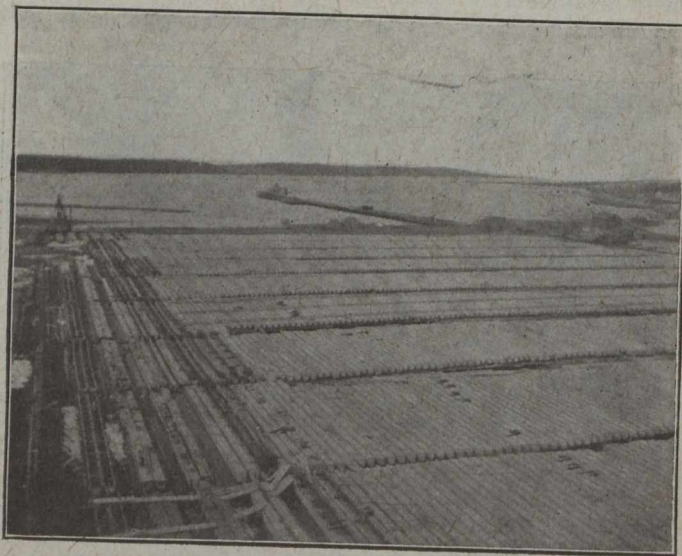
Pier No. 2—Pile Yard—Camber Piles
